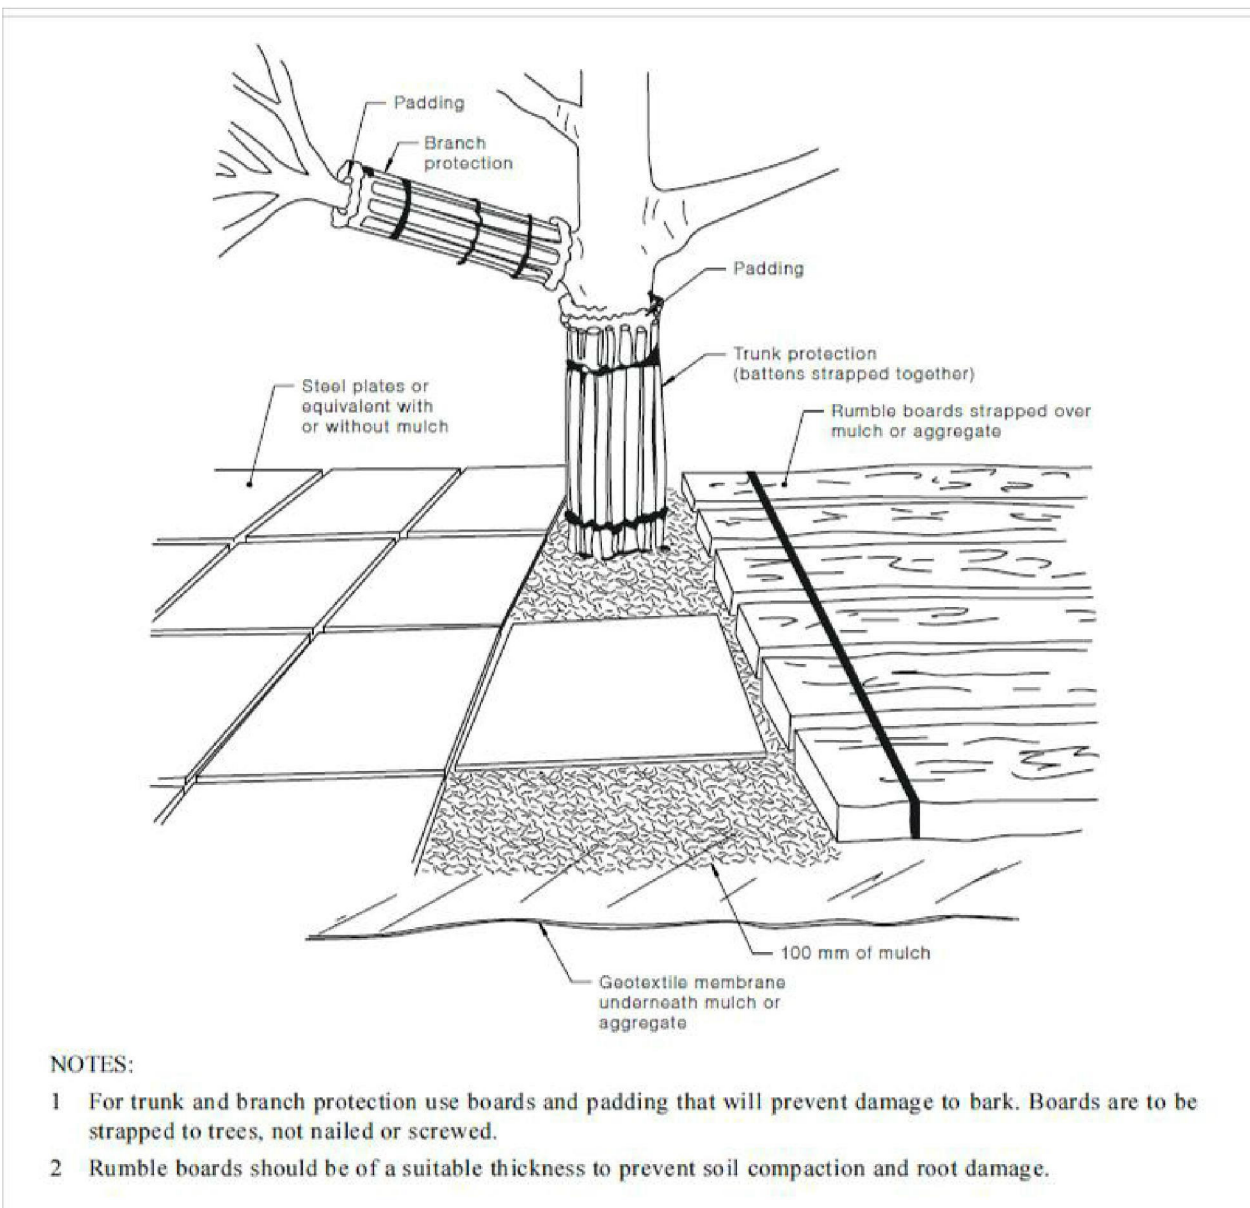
Examples of trunk, branch and ground protection as per AS4970- 2009
